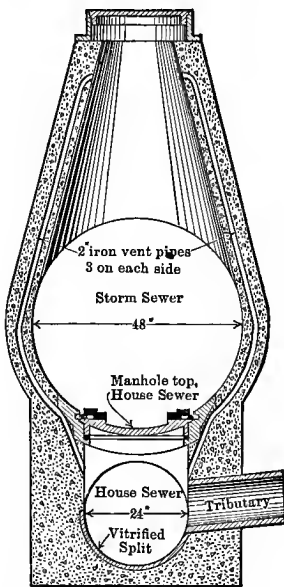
MANHOLE WITH SUB-DRAIN INSPECTION HOLE.
